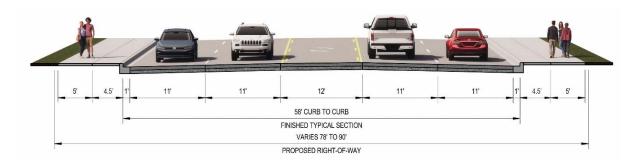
Pavement Replacement as a Wider 5-Lane Facility with Terrace and Sidewalk, facing north
